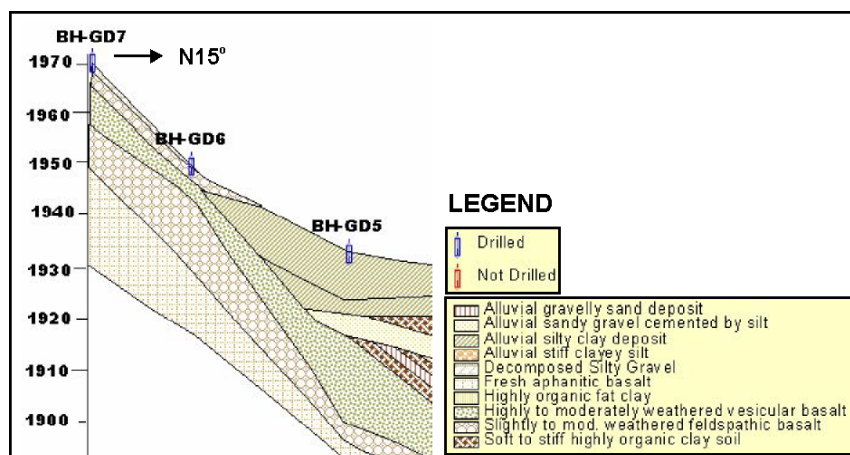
Slope Geometry and Geological section of Left Abutment
